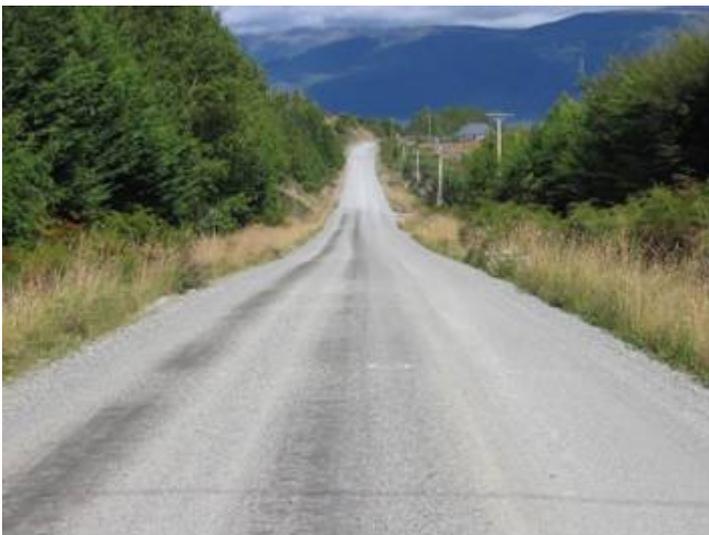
Sinclair Road - on Otta seal, looking south to control section
